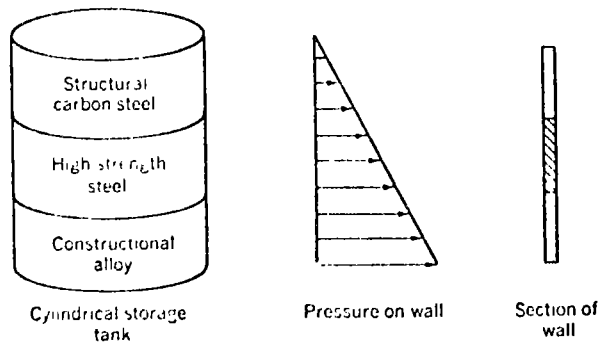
Hybrid Construction of Cylindrical Storage Tank²⁻¹²
